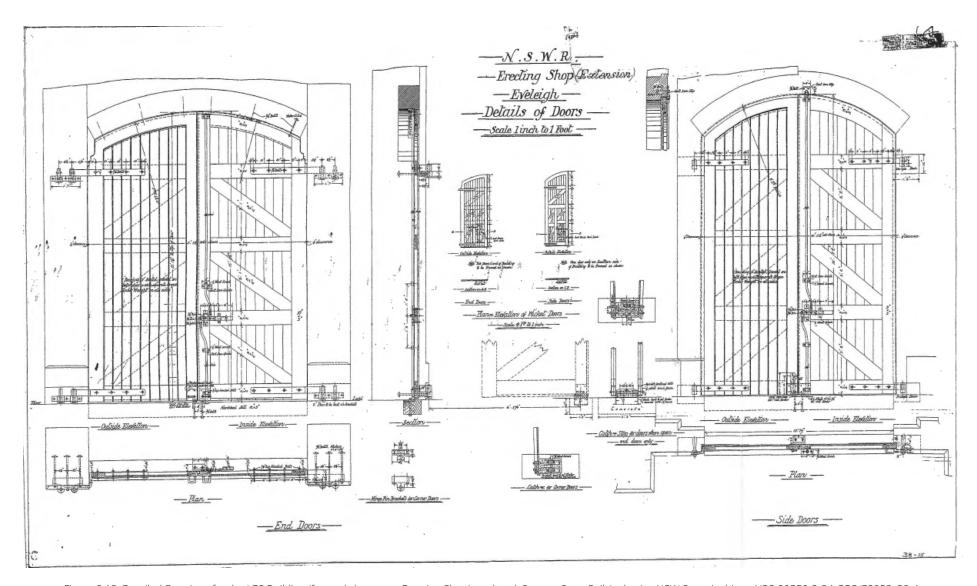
Detailed Drawings for the LES Building (formerly known as Erecting Shop), undated. Source: State Rail Authority, NSW State Archives, NRS-20550-2-24-COR/529P2, 38-4.
